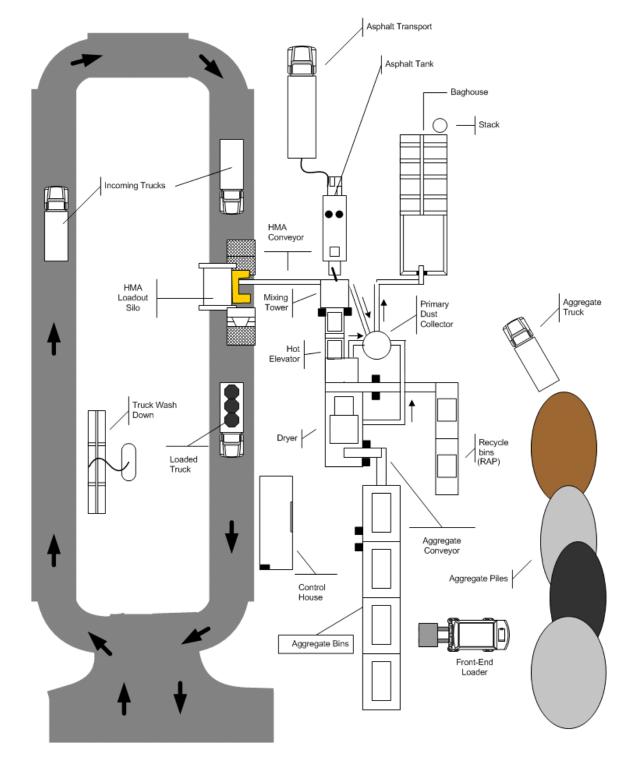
Typical Hot-Mix Asphalt Plant (Batch) Site Layout
